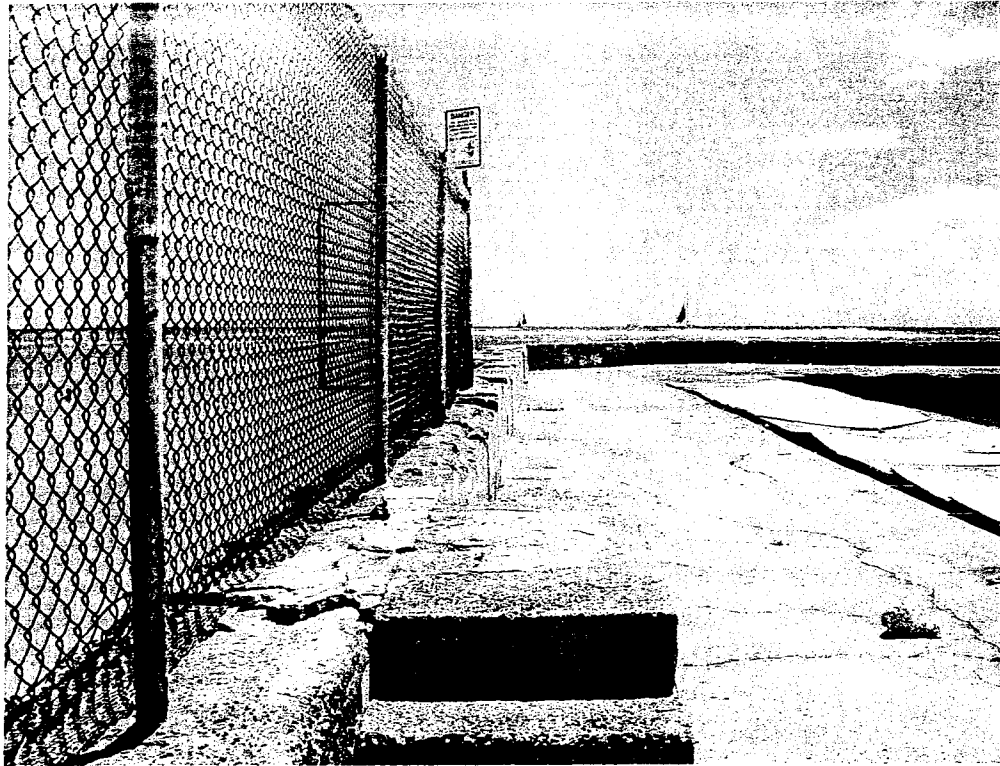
Tilting of Perimeter Concrete Sea Wall – Diamond Head End
